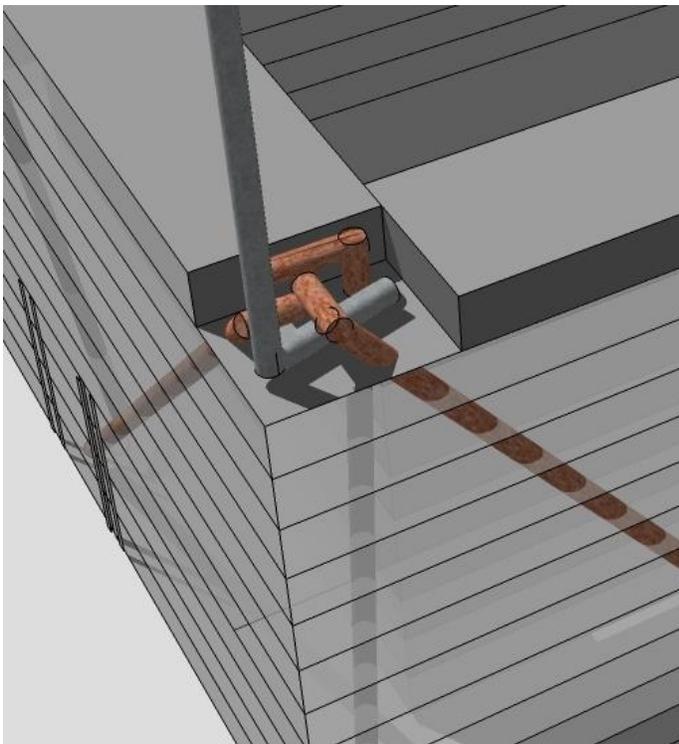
Forming space for spliced forks at corners to connect diagonal and vertical rebars.
